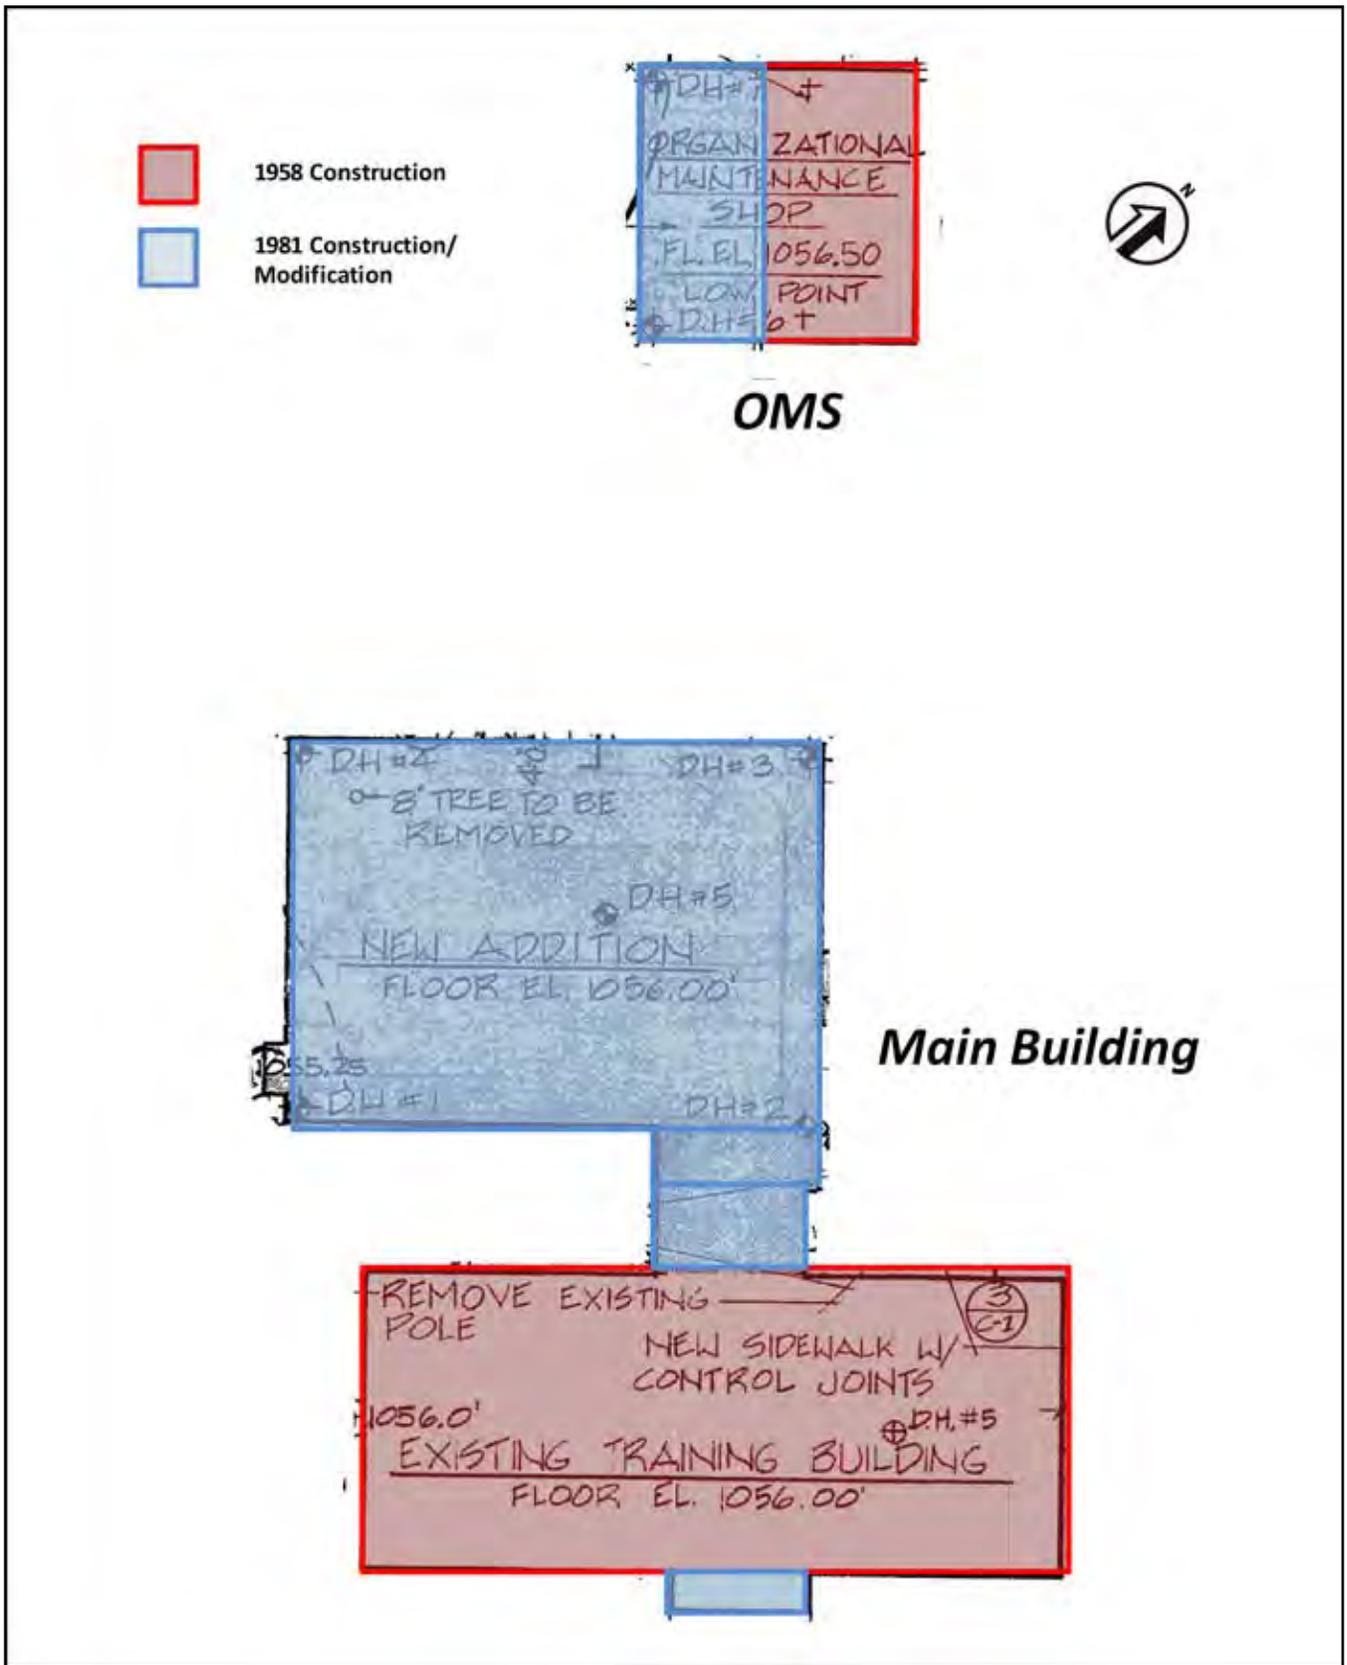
Colborn USARC, current architectural footprint of the main building and OMS (altered from ECP [not to scale]).
